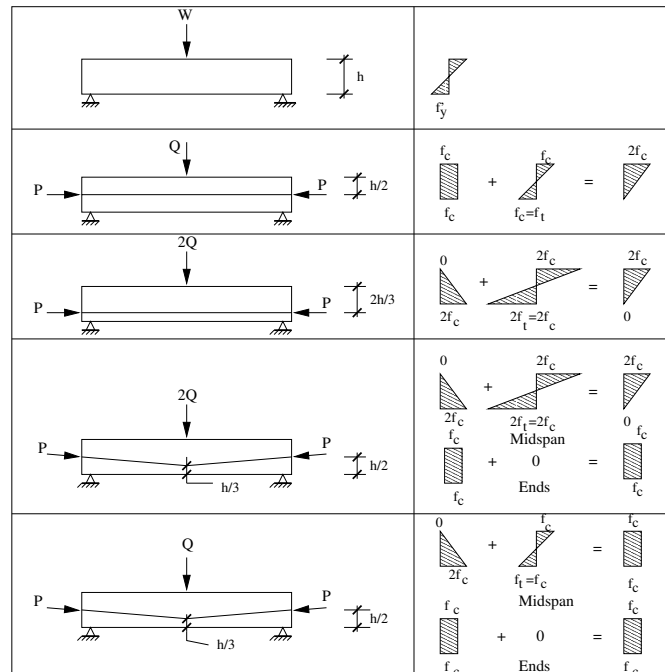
Alternative Schemes for Prestressing a Rectangular Concrete Beam, (Nilson 1978)
